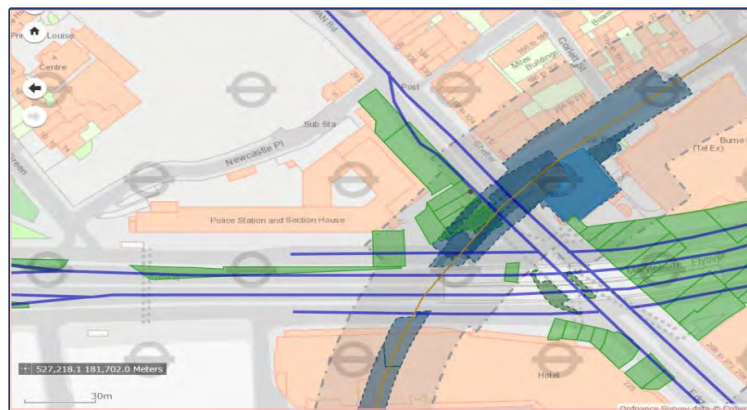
Plan- LUL Tunnel Station box and running tunnels
